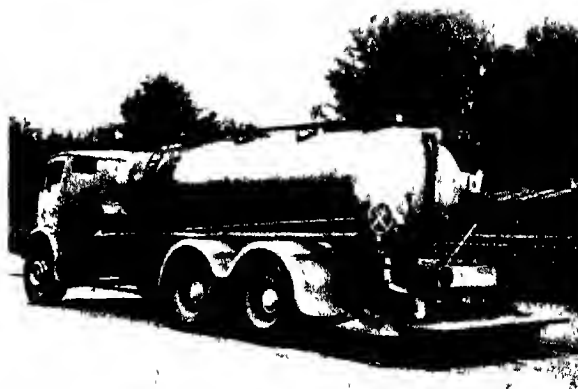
MECHANICAL SURFACE DRESSING IN PROGRESS
